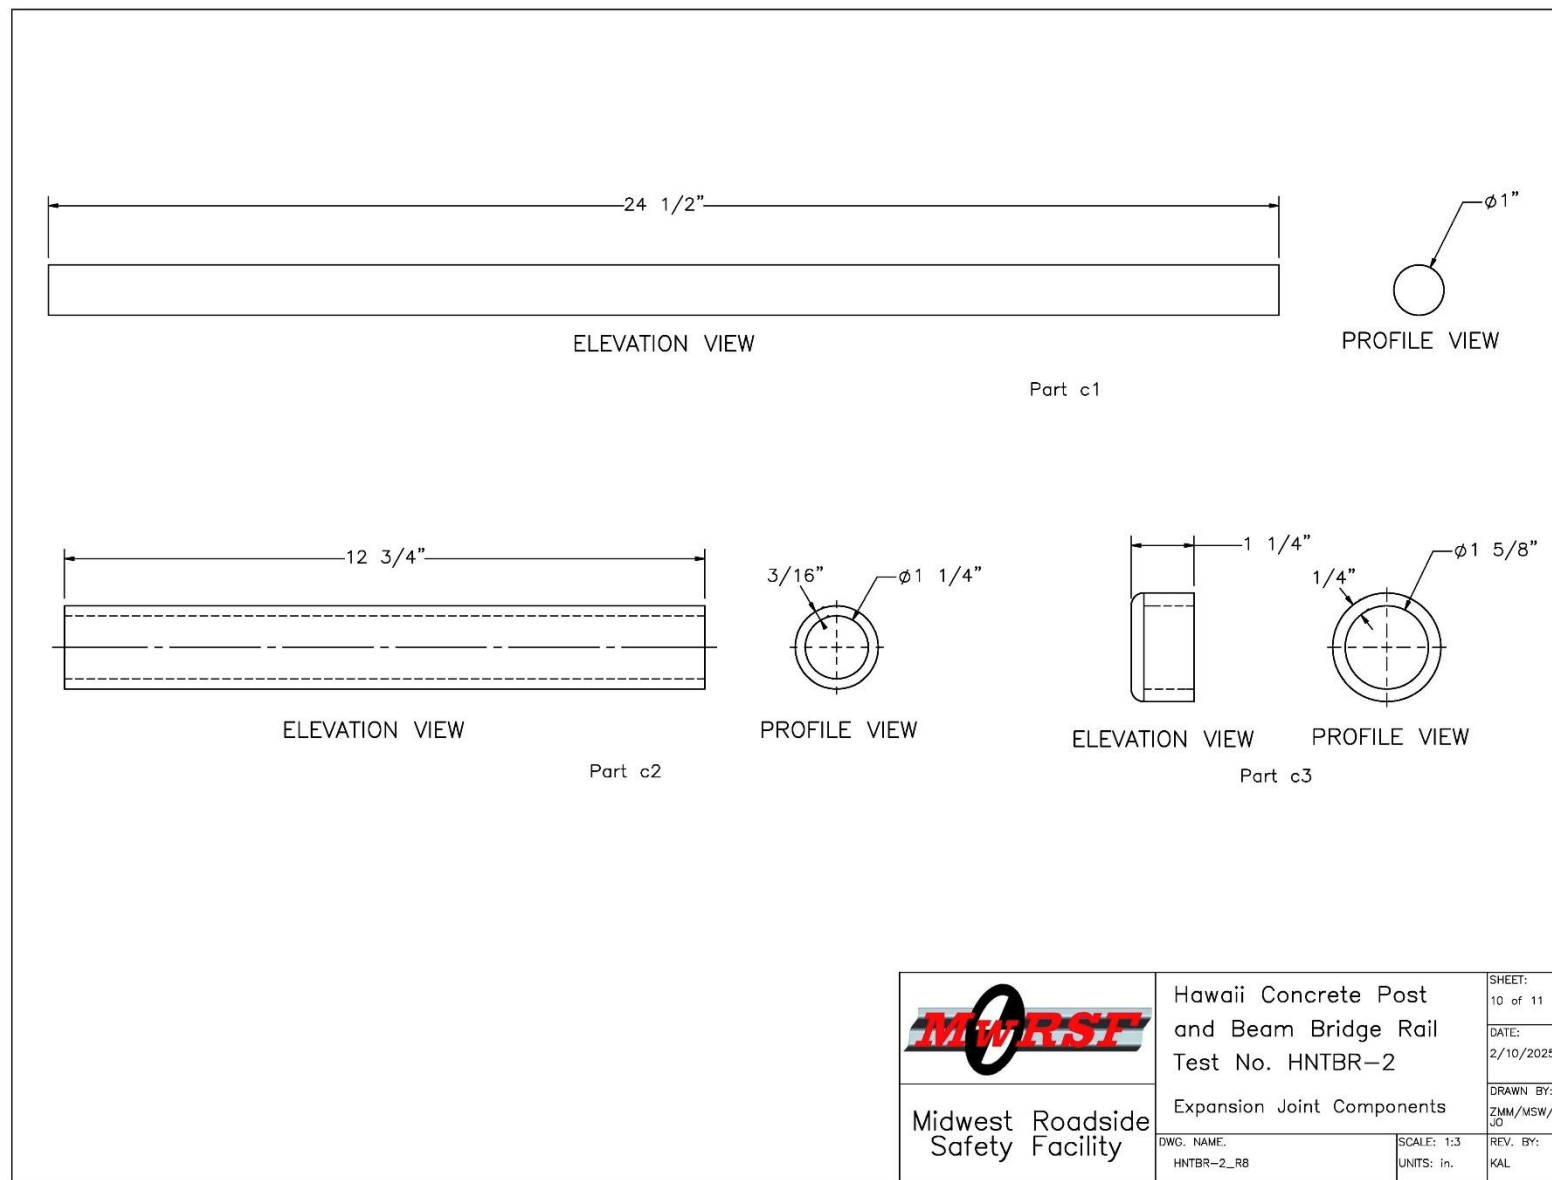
Pipe Details, Test Nos. HNTBR-2 and HNTBR-3
